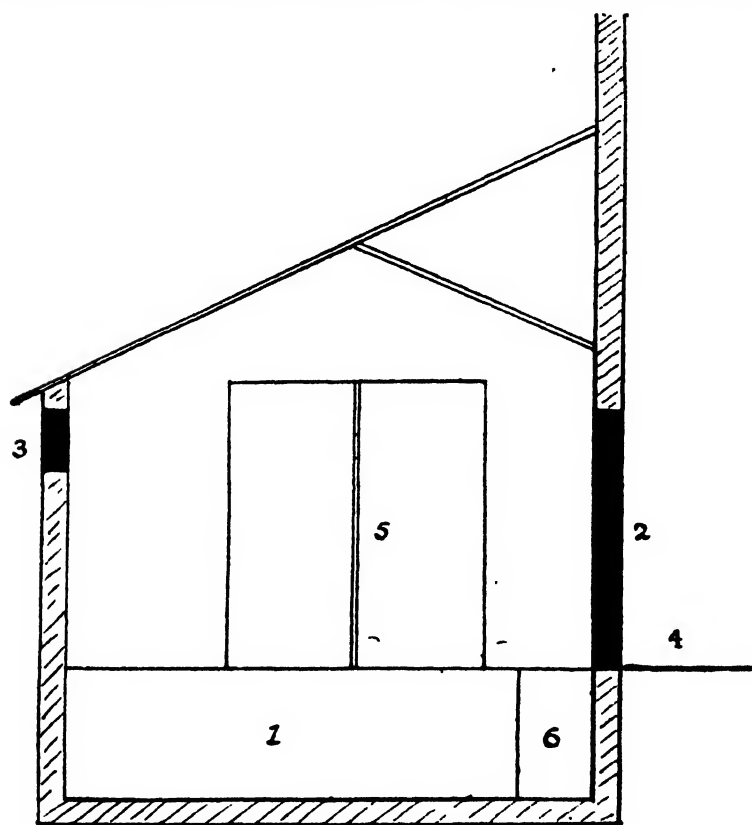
Solid Manure Pit adjoining Cattle House.
